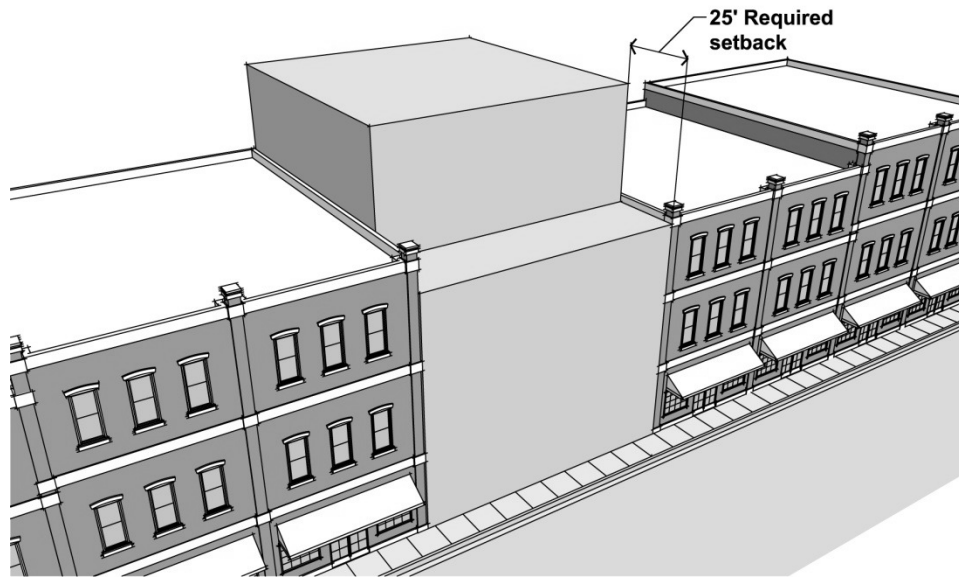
(E) (1) C-1, C-1-E and C-1-VC Districts Illustrative and Site Diagram
